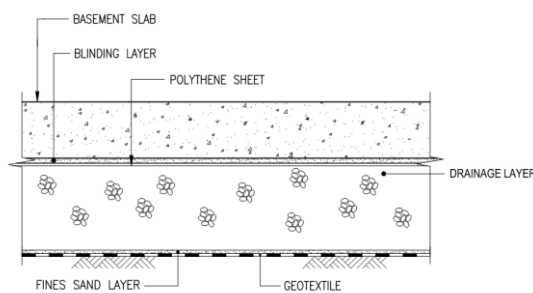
Typical detail of drainage layer installed underneath the basement slab
